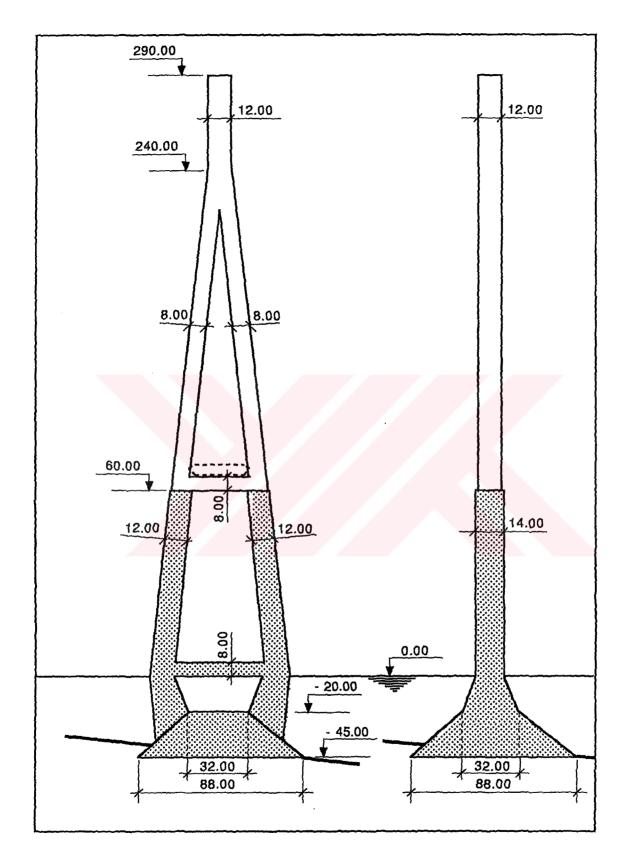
NORTH TOWER, KABA BURUN SIDE (In meters)
